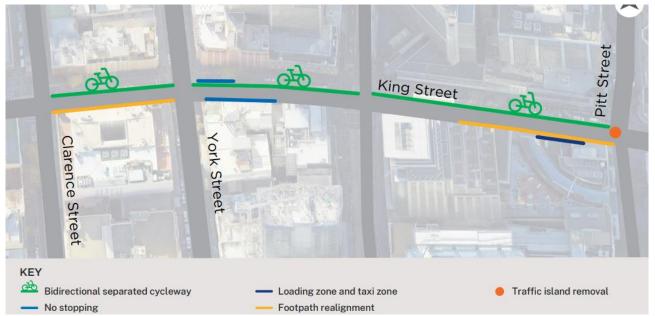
Plan showing the stretch of King Street that is currently missing a safe, protected cycleway (Source: TfNSW)
